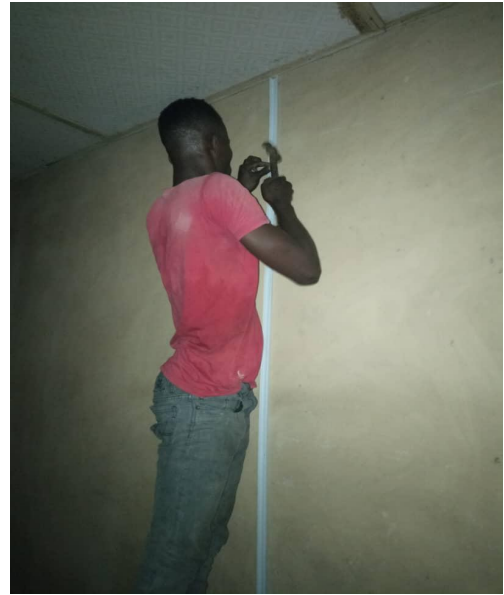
Wiring of the Building, fixing of Power Bulbs and Fixing Fan
